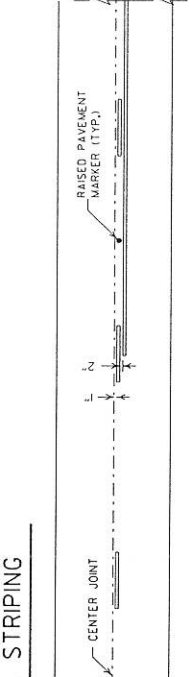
DETAIL OF STANDARD RAISED PAVEMENT MARKERS
